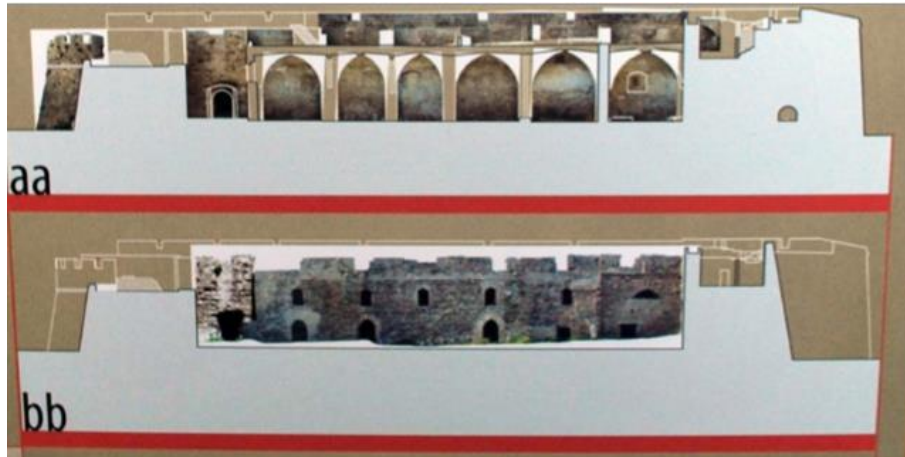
Sections and view from Great Vaulted Hall in Othello Tower, (UNDP-PFF, 2016)
